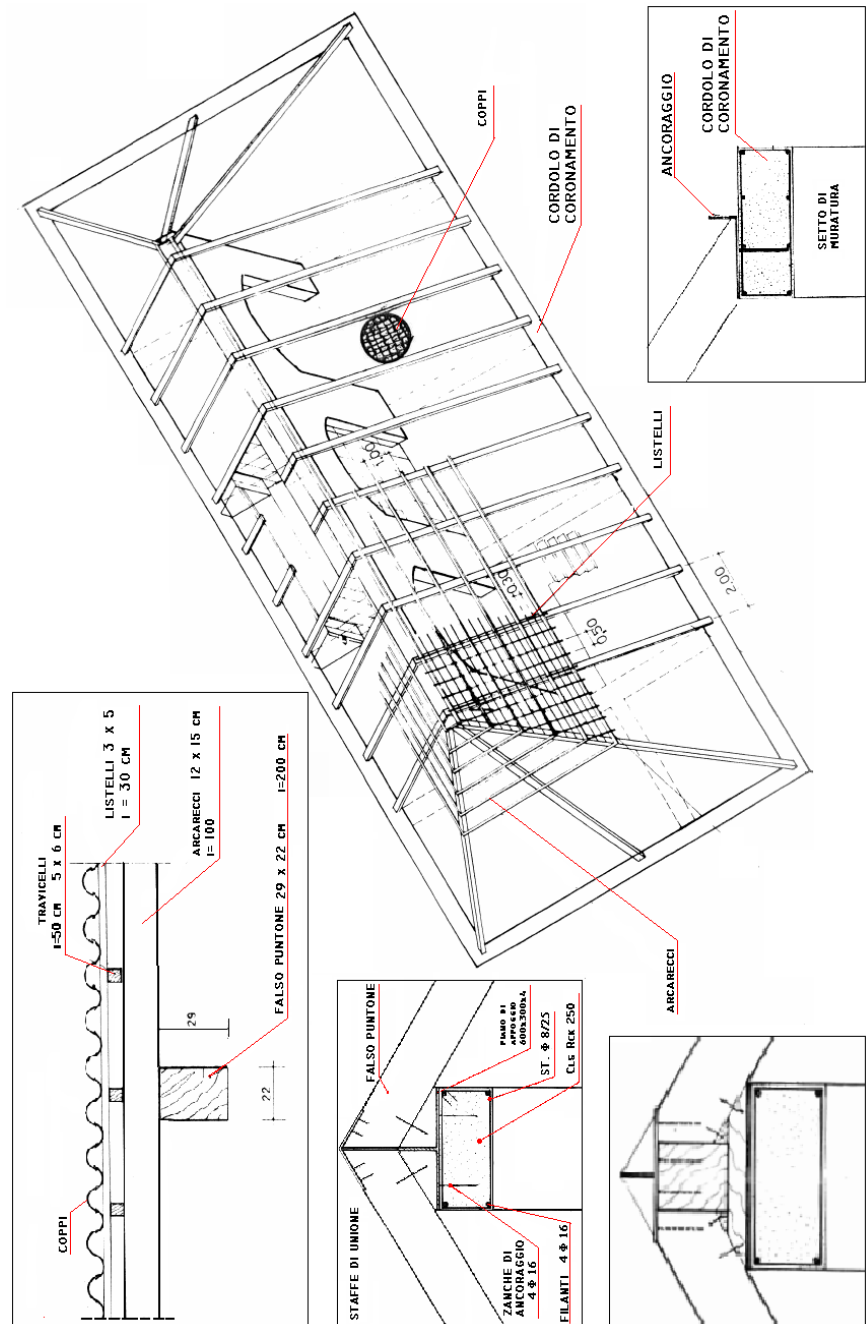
Roof structure and construction details (redrafted from an design table by Ente Ville Vesuviane Archive)
